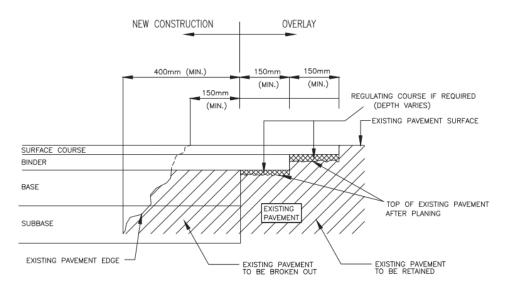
Longitudinal Joint between new construction and existing road as per CC-SCD-00704-02
